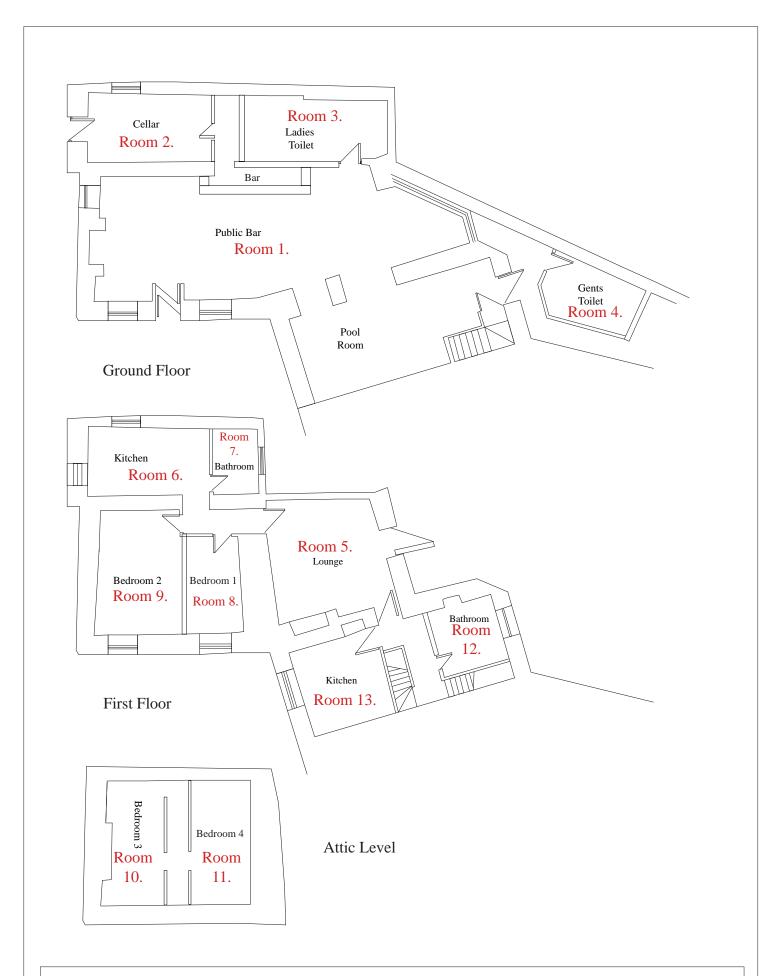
Caernarfon Castle Public House Existing Floor Plans Modified From 1970's Originals. Scale Given 8'0" to 1 Inch
